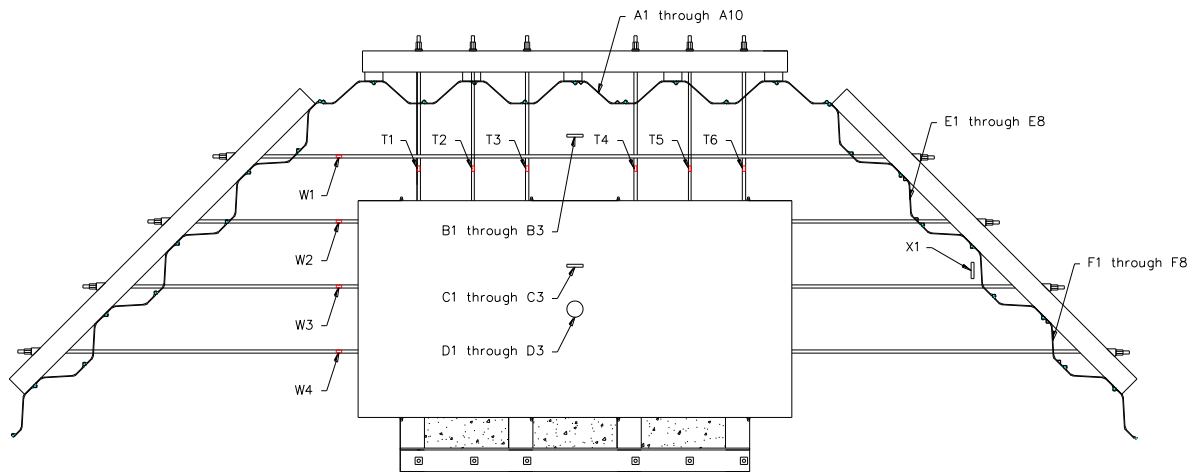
Plan view of instrumentation in south bridge abutment system in TC
